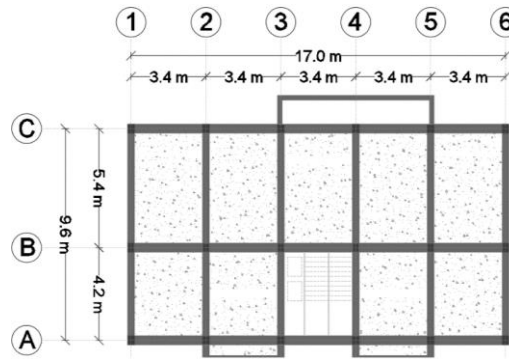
The plan view of the Template Design 3 (TD_3) building
